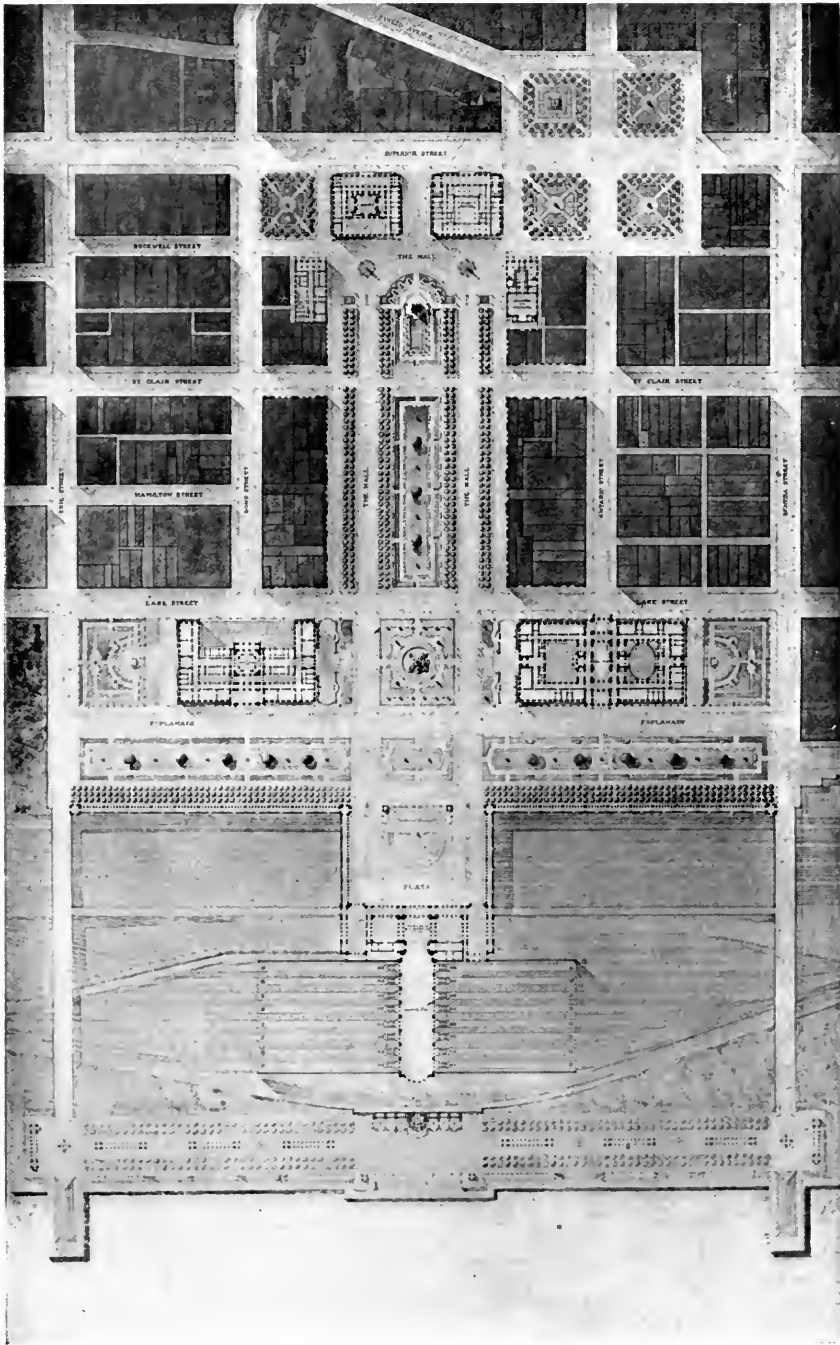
SCHEME B. IN THE GROUP PLAN FOR THE PUBLIC BUILDINGS OF CLEVELAND, SHOWING THE TREATMENT OF APPROACHES, PARKWAYS AND PLEASURE GROUNDS.
